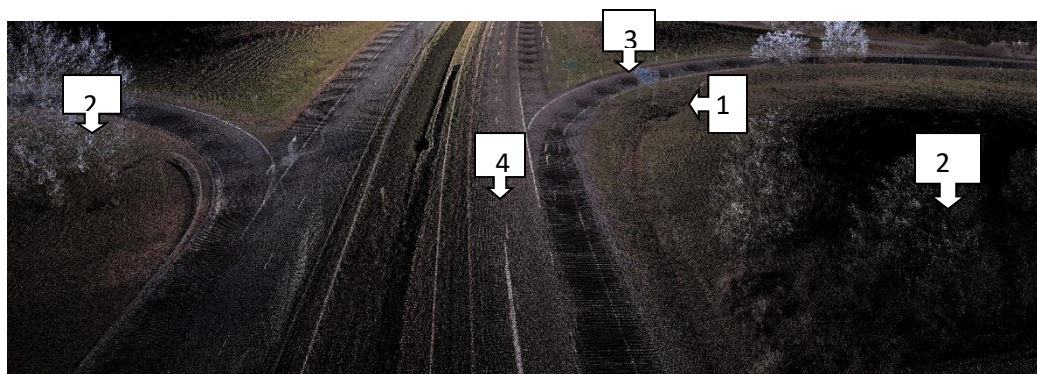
Section of Mombasa Road at Southern Bypass Interchange; Colorized Point cloud showing; 1 road signs, 2 road side trees, 3 guardrails and 4 road surface & markings. (Source: KeNHA data)
